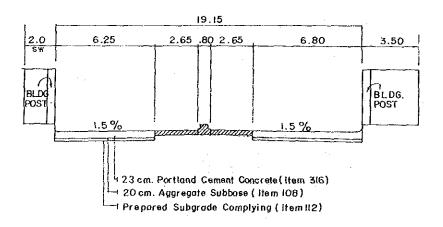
PROPOSED IMPROVEMENT: URBAN SECTION OF SAN JOSE CITY PAVING OF SHOULDER AND SIDE WALK (SHORT ERM)
